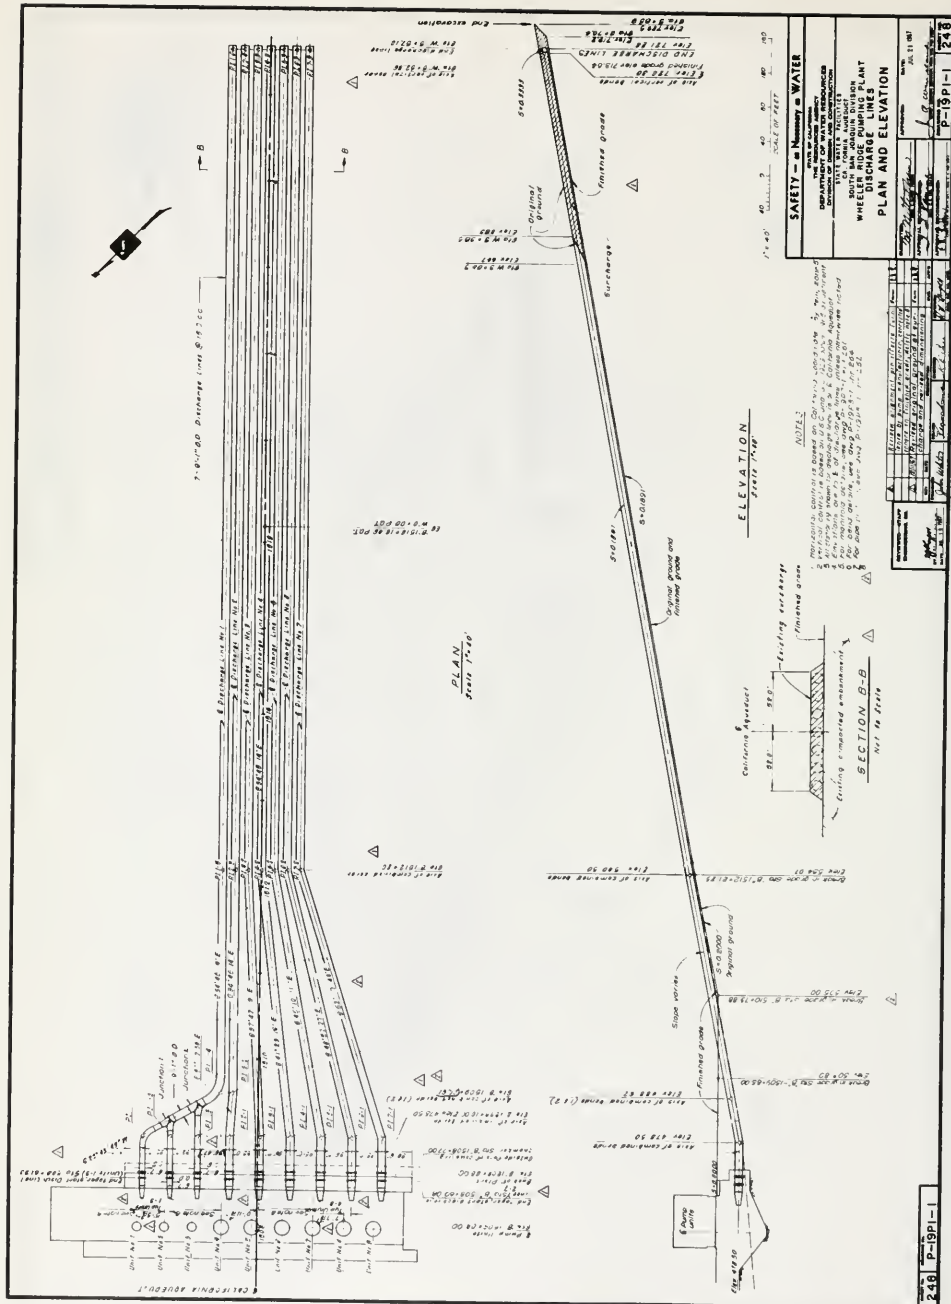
Discharge Lines—Plan and Elevation—Wheeler Ridge
